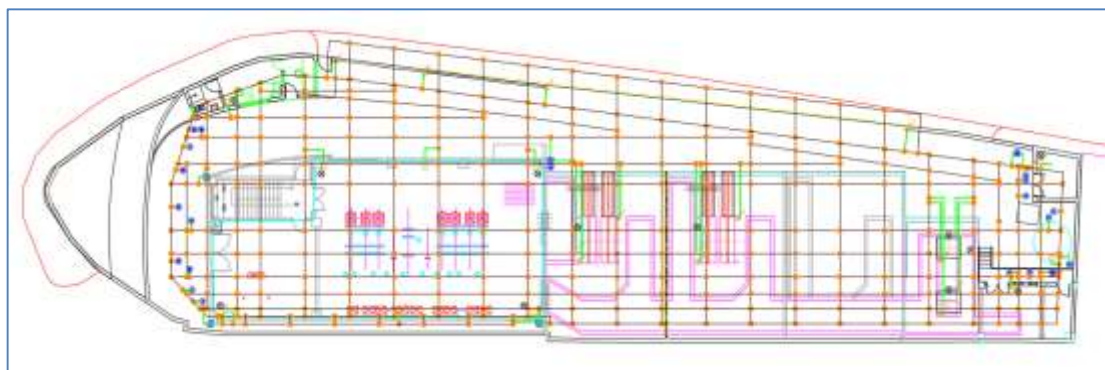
Layout and Ground Mesh Plan of Colombo M Grid Substation
